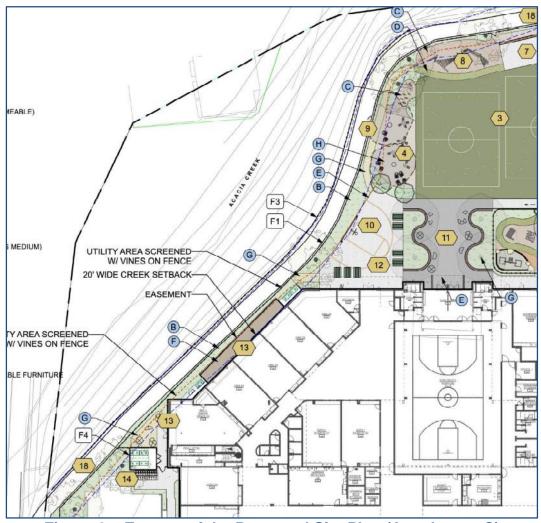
Excerpt of the Proposed Site Plan (Attachment C)
